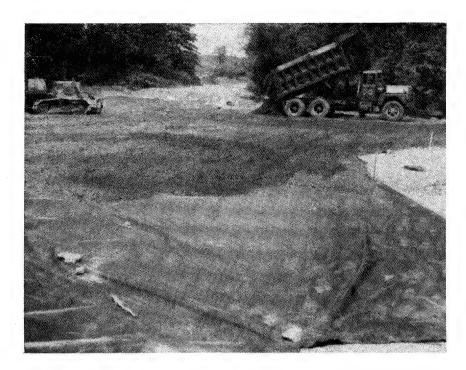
Fill being placed over geotextile fabric at Aberdeen Proving Ground (from Anderton 1991a)
